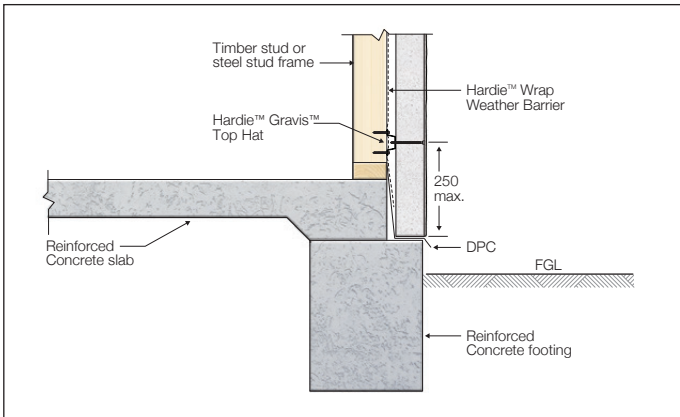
JUNCTION TO SHALLOW CONCRETE EDGE BEAM
